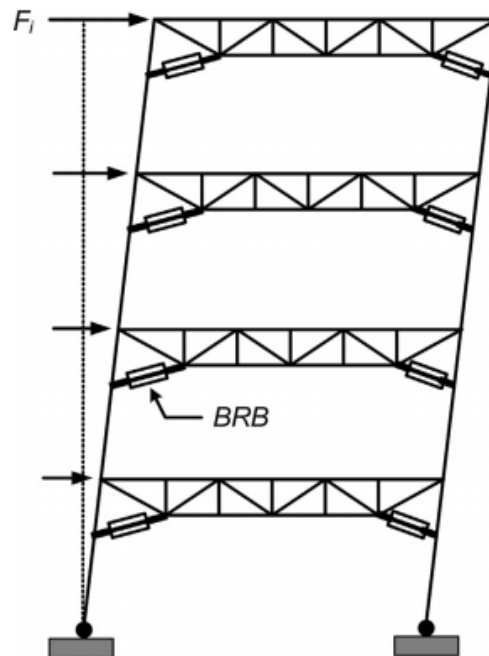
Buckling-Restrained Knee-Braced Truss Moment Frame System (Adapted from [37]).
